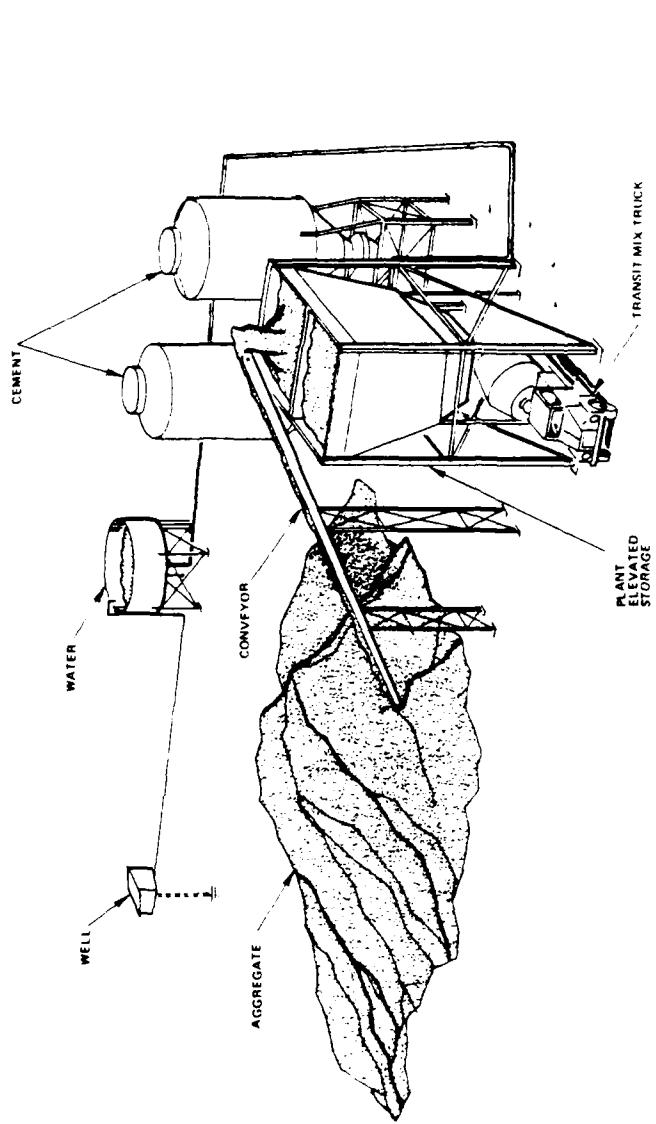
Conventional cast-in-place concrete plant.
